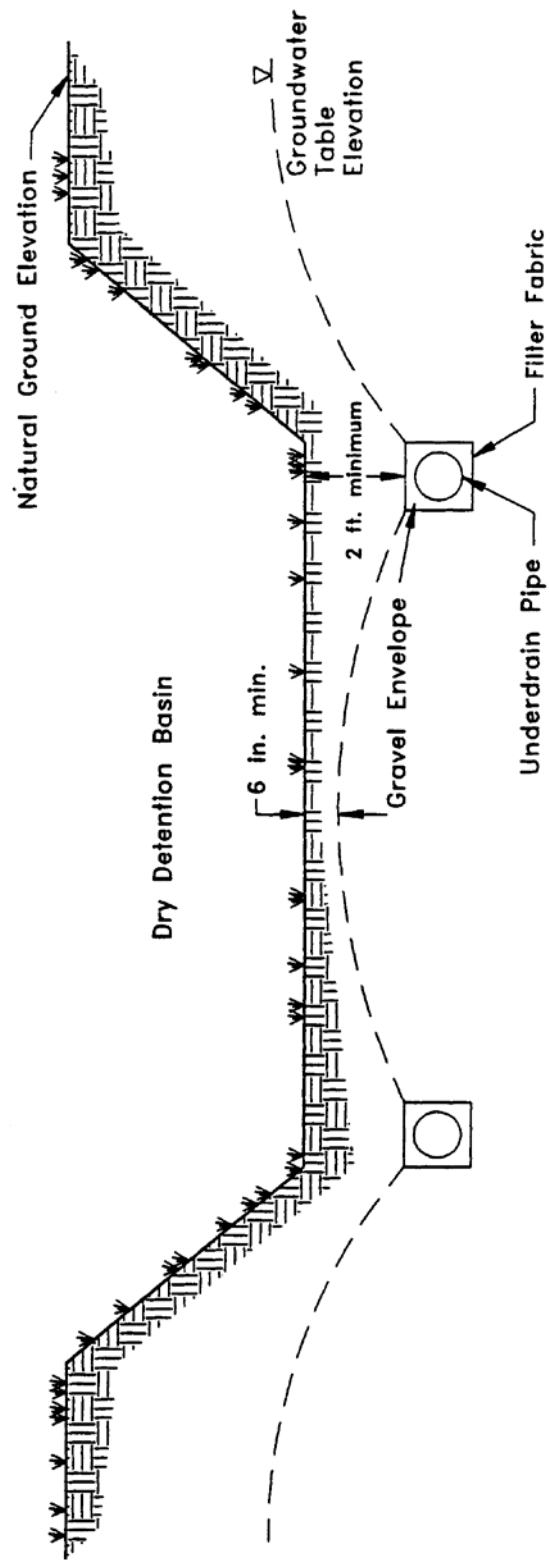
Cross-section of underdrain system (N.T.S.)
